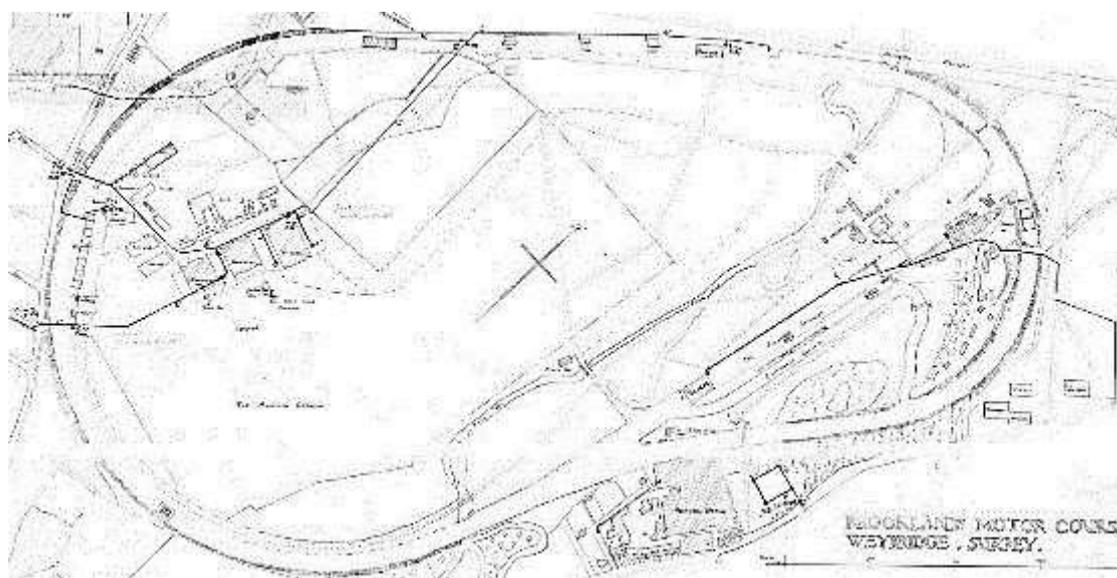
c.1940 plan showing World War 2 aerodrome layout, including balloon sites and defensive gun sites
